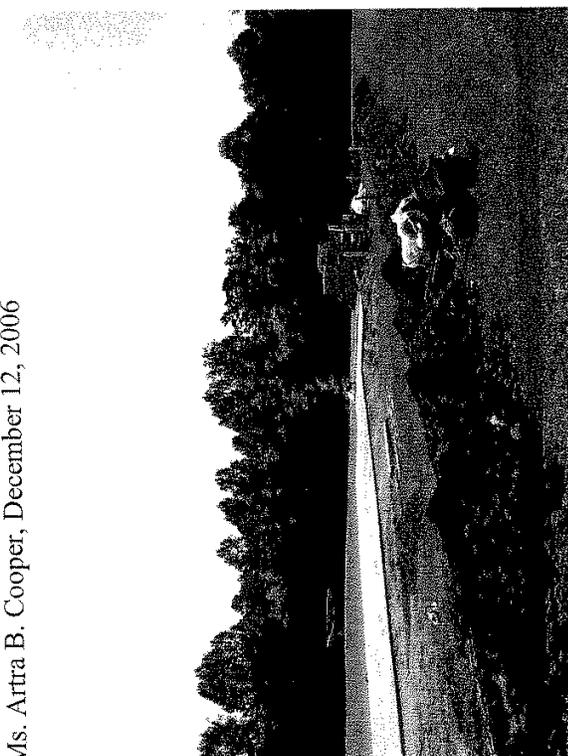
Construction of Bleachers Southeast of Monitoring Site
